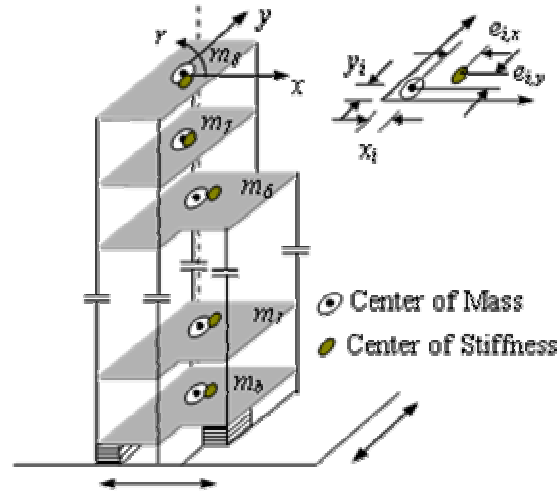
Elevation View of the Asymmetric Base Isolated Benchmark Building
